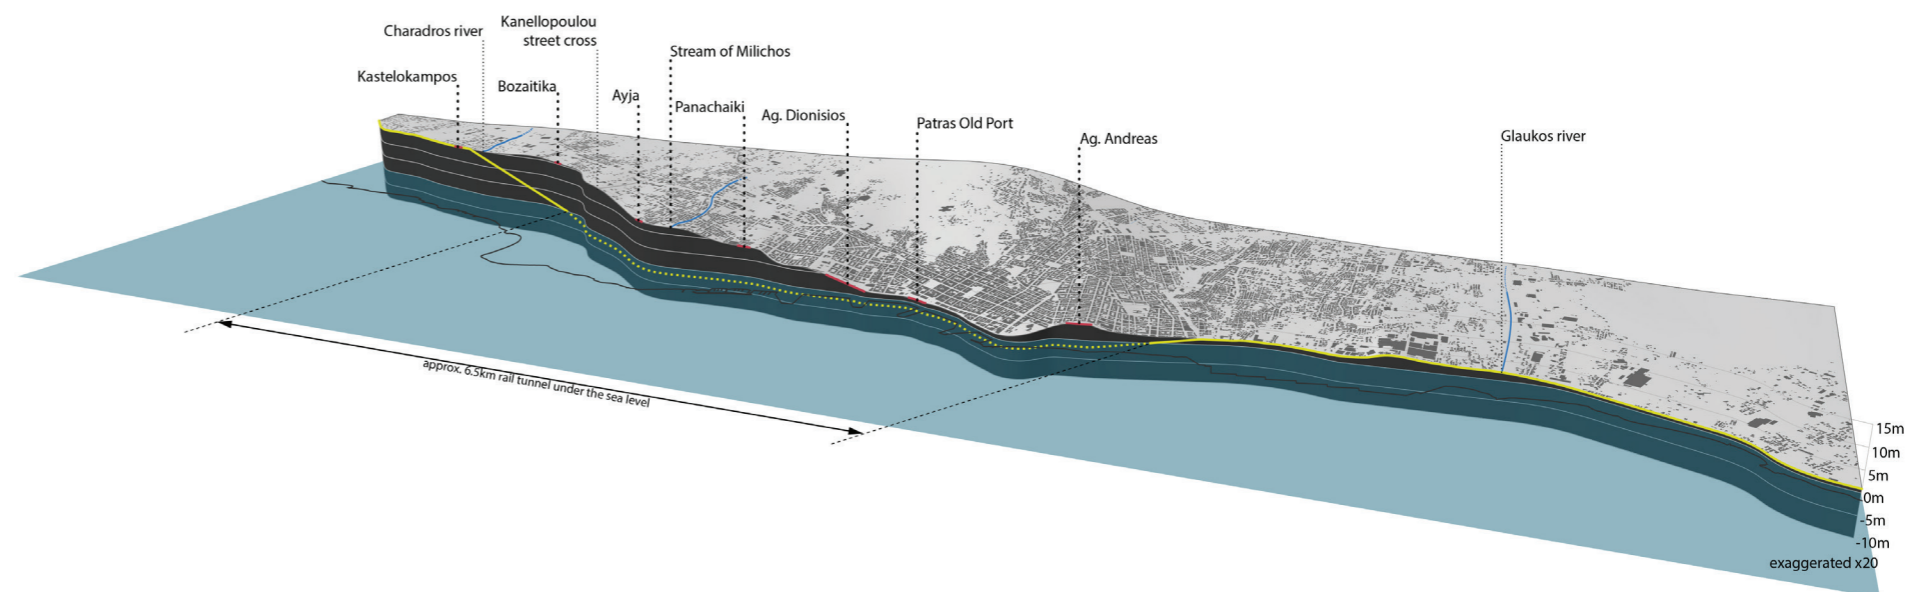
Master plan of the railway development of the long tunnel solution, (source ETH, IRL, IT, MN).
